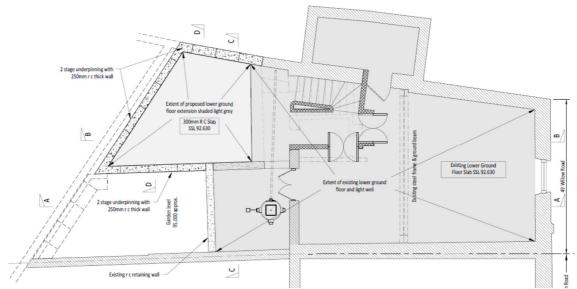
Lower Ground Floor Plan Showing Proposed Extension
